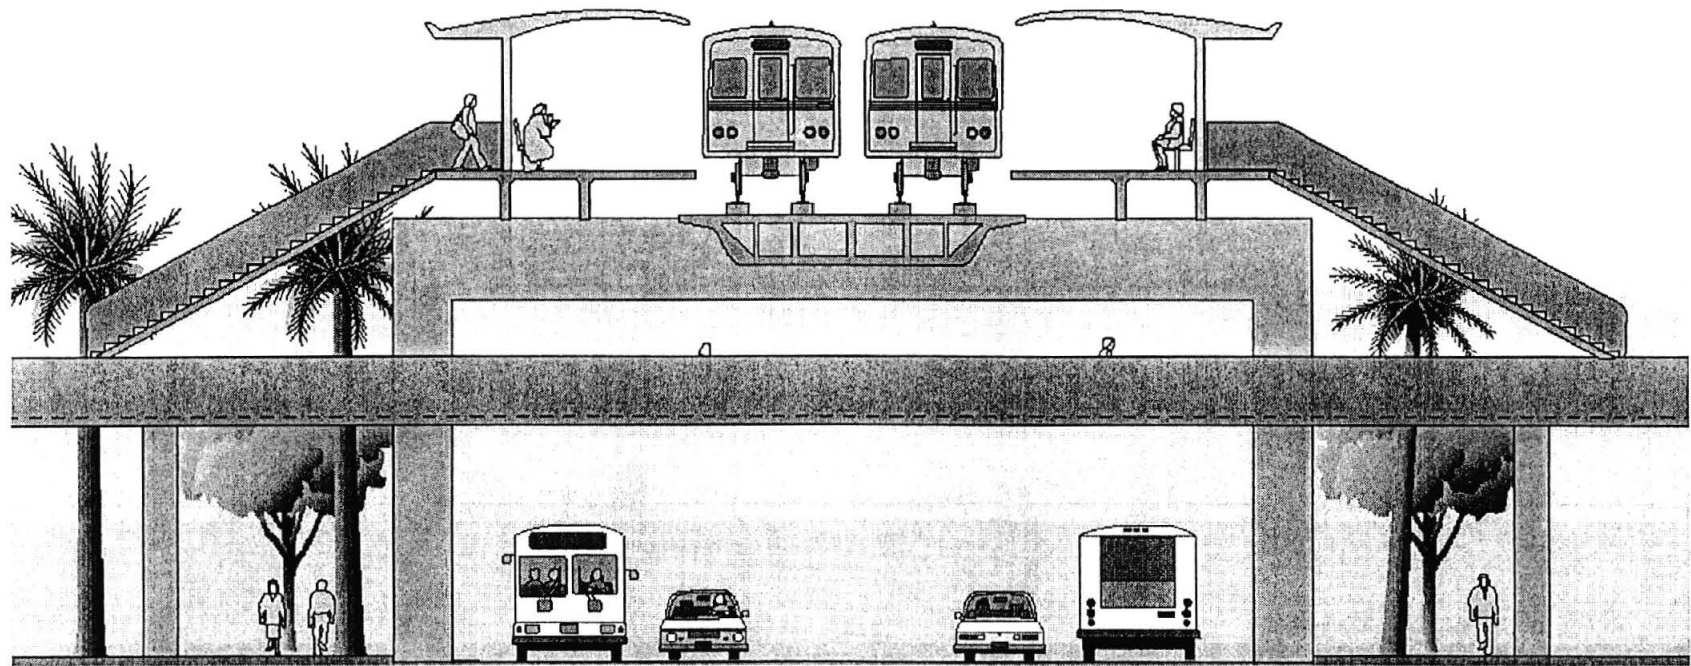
depicts an arrangement for a station on the aerial structure. The station would use the double track structure with a platform outside of each track.
